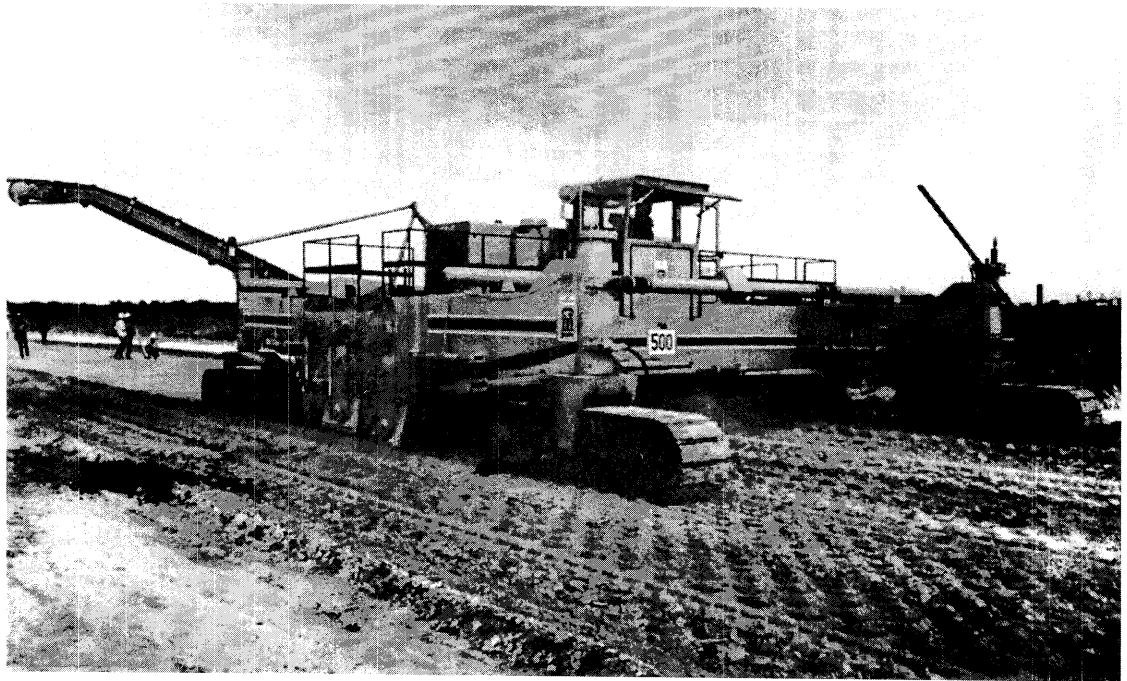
Large grade trimmer/reclaimer/paver. (Courtesy of Terex Roadbuilding)
